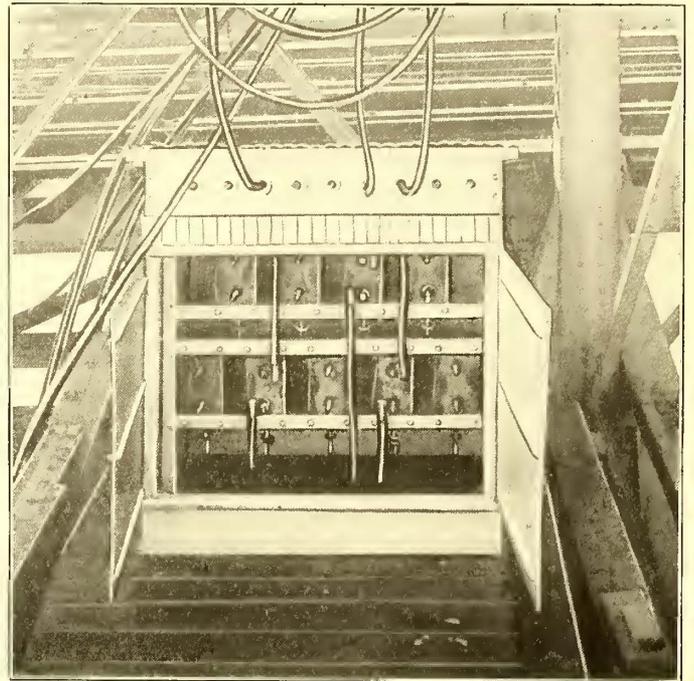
SWITCH HOUSE FOR CABLE CONSTRUCTION
